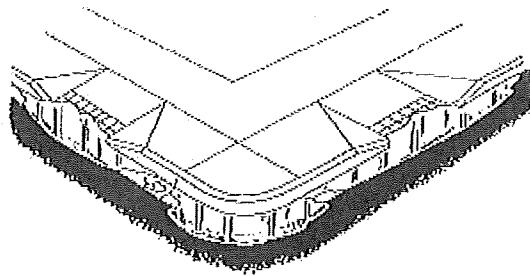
POTENTIAL PROBLEM: Curb ramps that are susceptible to pond formation are inconvenient and unsafe (especially when water freezes) for all sidewalk users.
